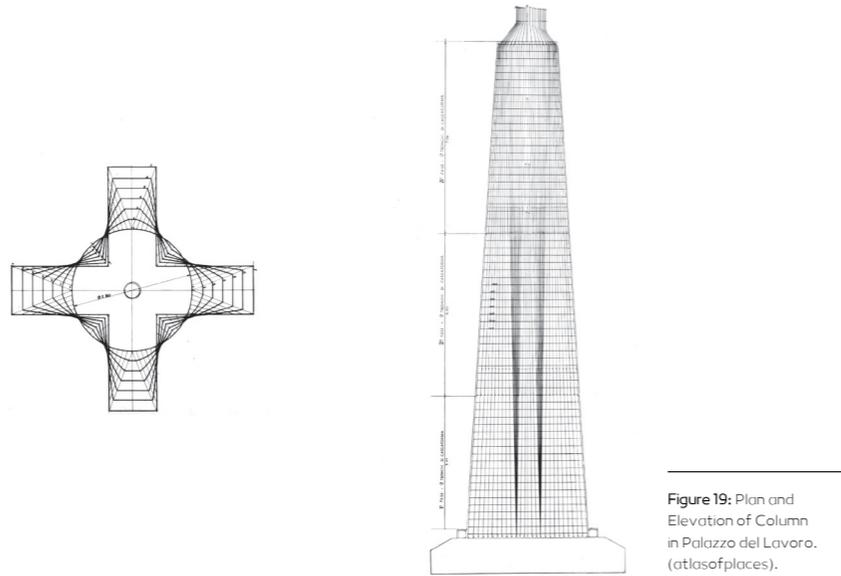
Plan and Elevation of Column in Palazzo del Lavoro. (atlasofplaces).
